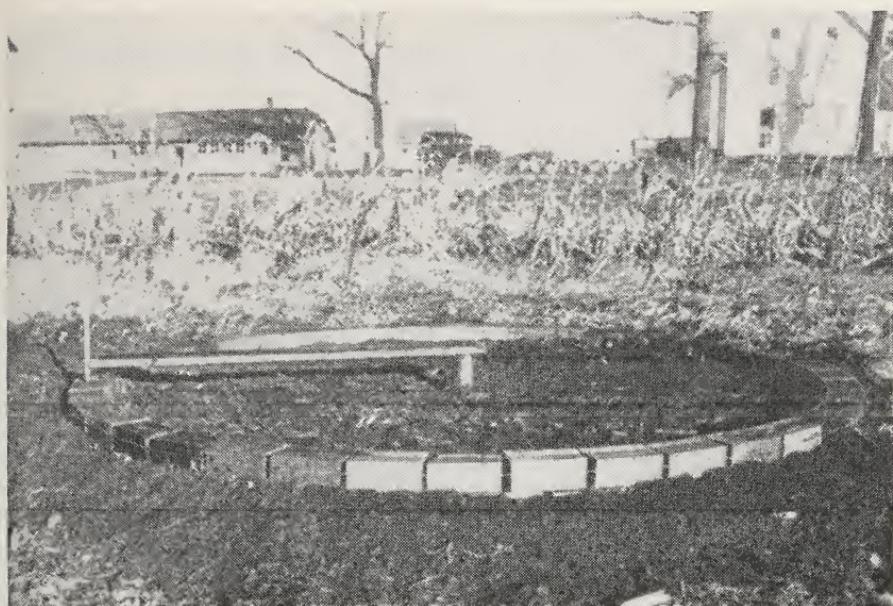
First step in construction of foundation for round steel bin. Concrete blocks or load-bearing tile laid in trench, on firm soil, and leveled by means of carpenter's level on swinging radius bar. Note steel wire to hold blocks in position.
